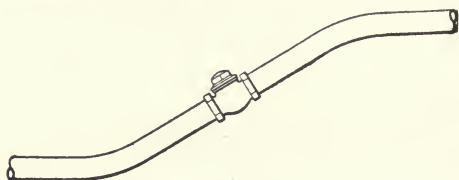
Method of Fitting Check Valve to Allow it to Swing Freely.
